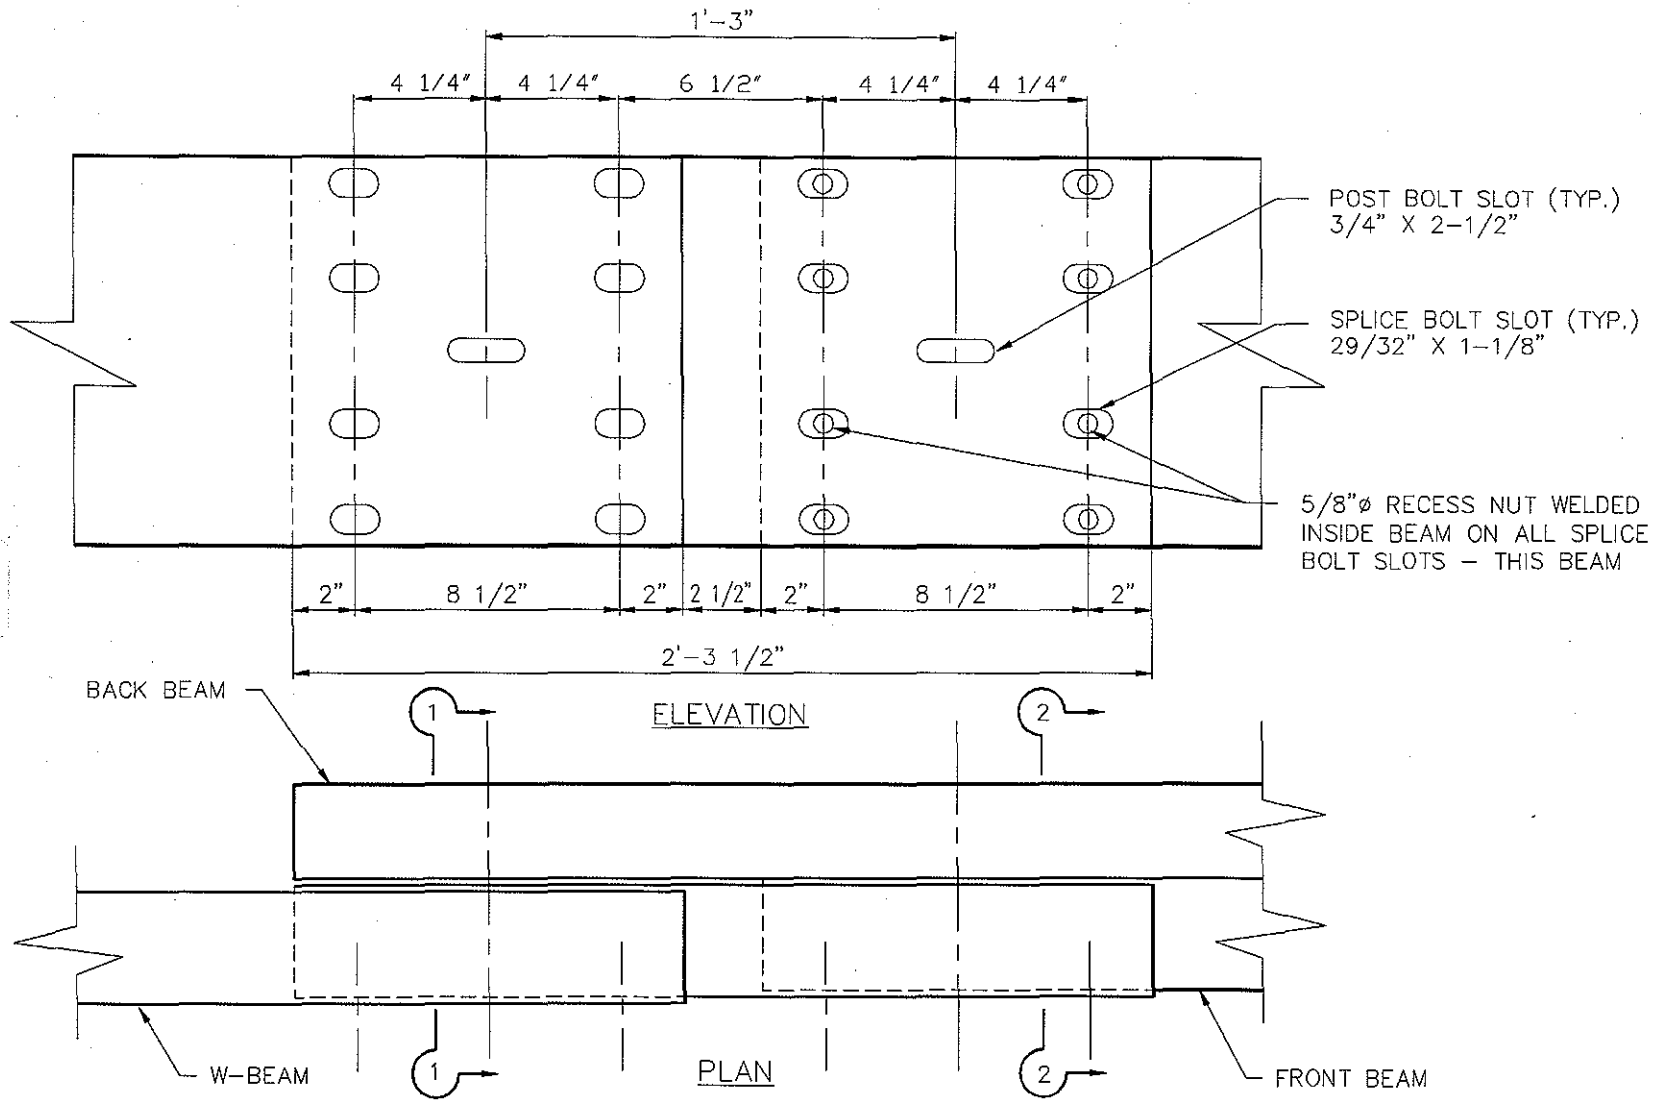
LAP SPLICE DETAILS FOR RETROFIT INSTALLATION
